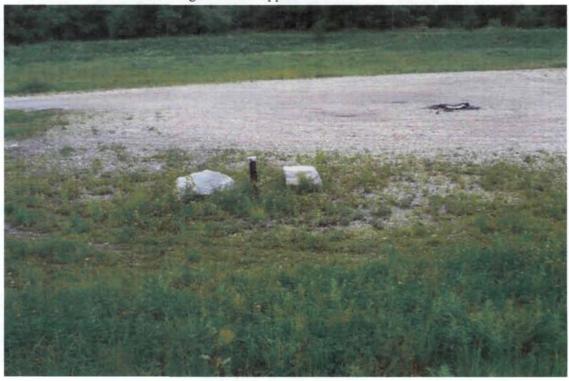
Animal burrow at edge of riprap above Culvert No. 2
